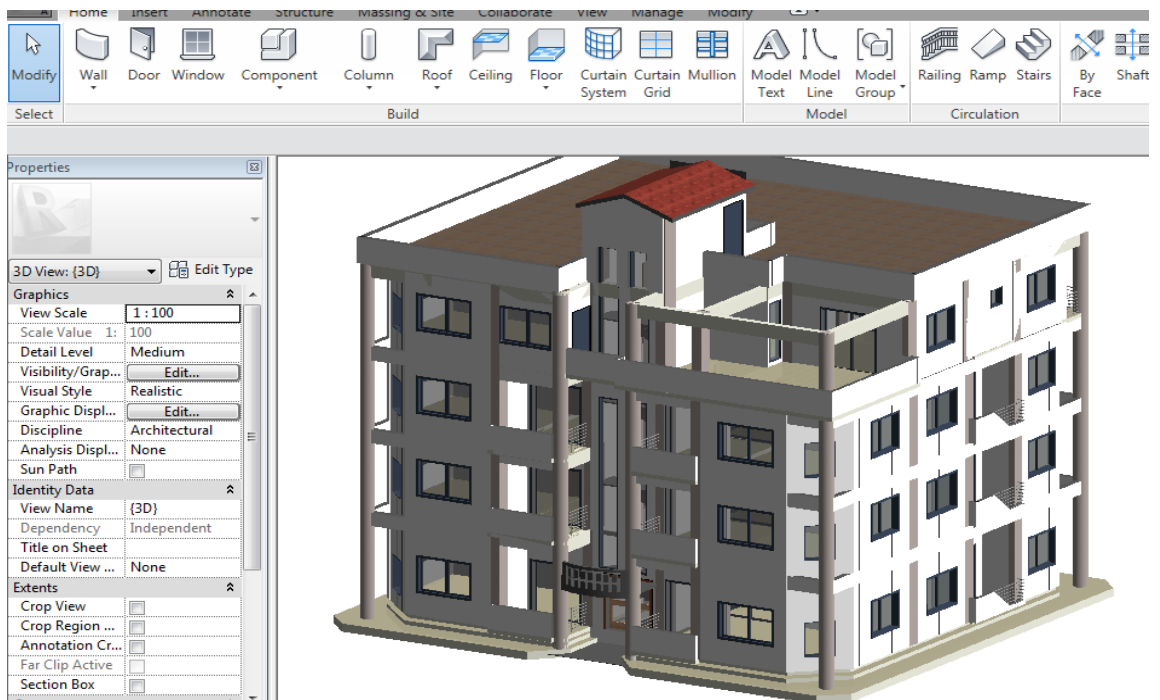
3D View of the apartment building in Autodesk Revit Architecture
